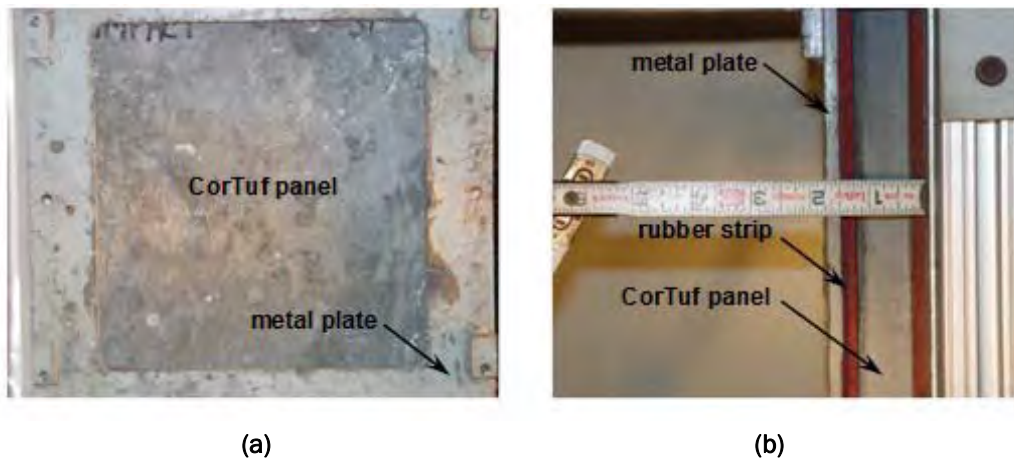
CorTuf panel mounted in test support fixture, (a) front view (impact face) and (b) side view.
